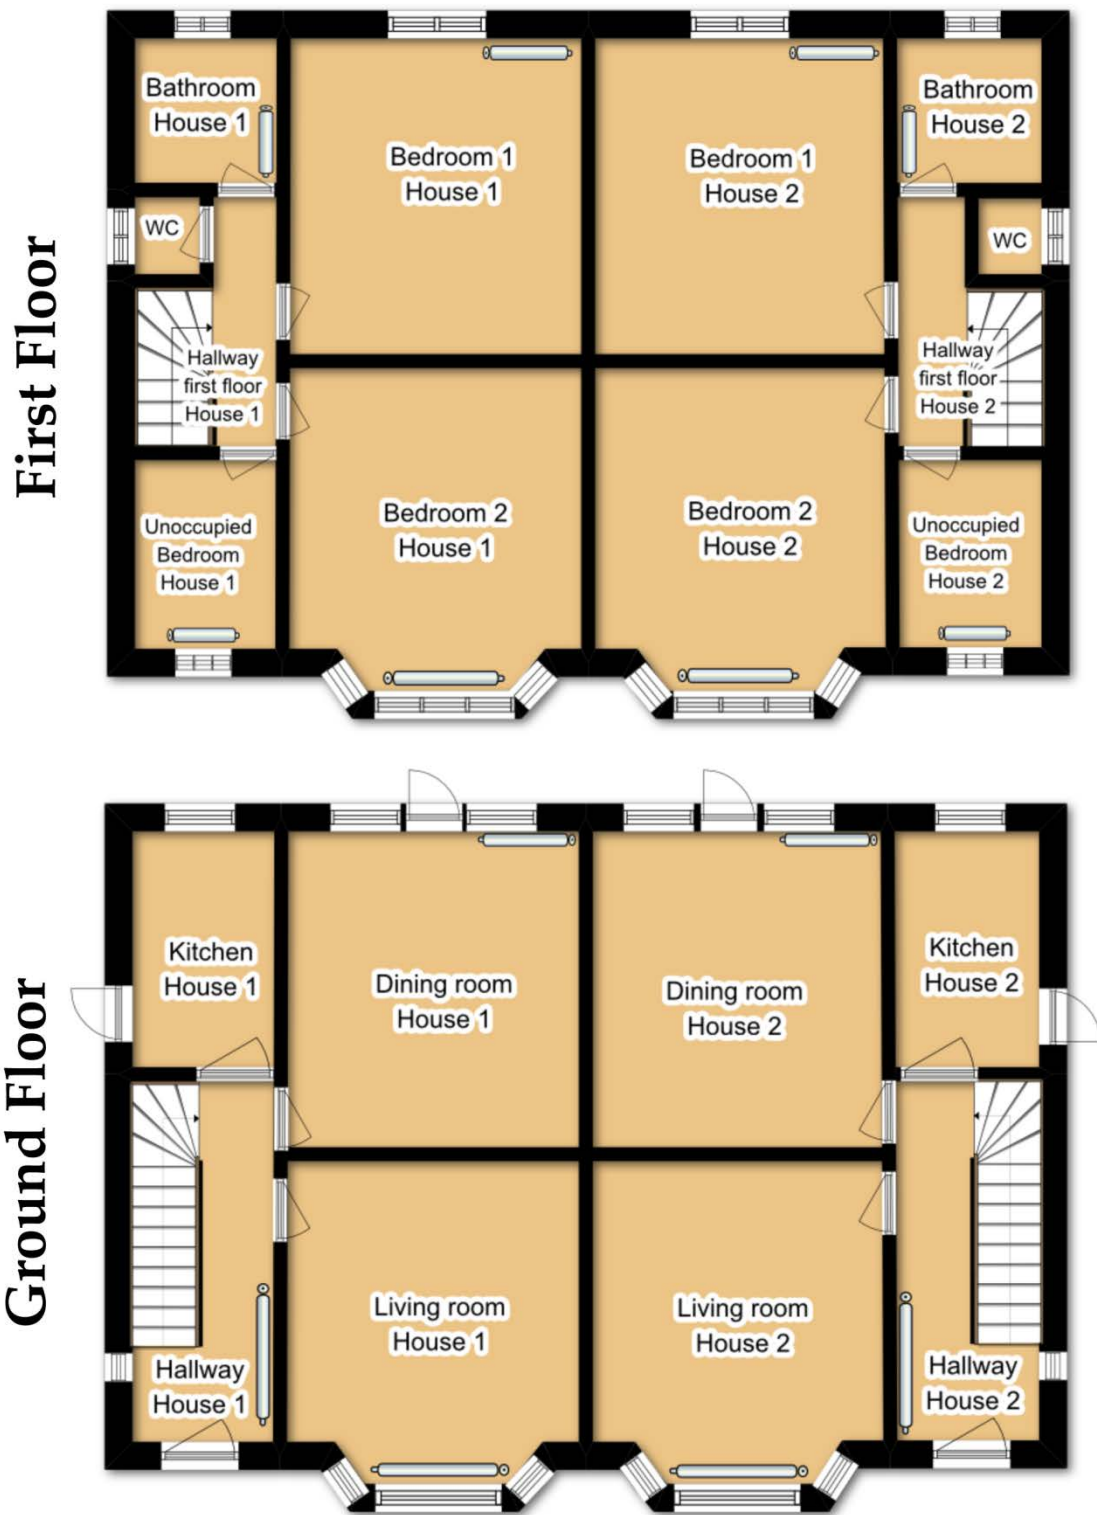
LMP1930 test house model zoning strategy for ground floor and first floor
